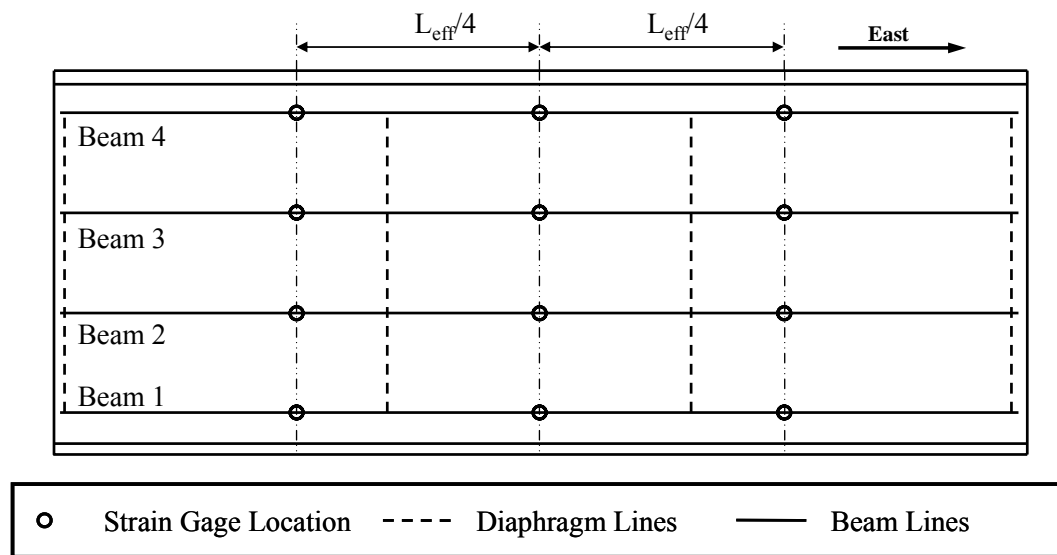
Instrumentation Plan for Lake LBJ Load Tests
